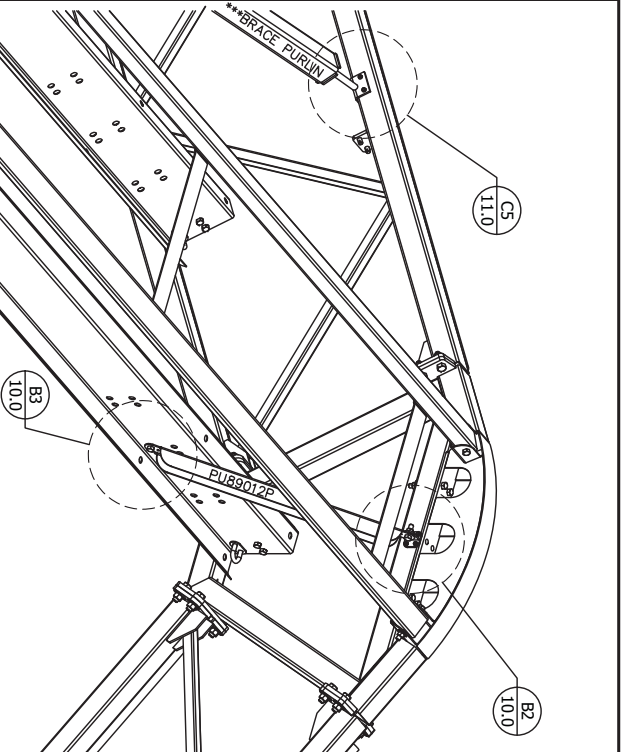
70'-80' VP END TRUSS CONNECTION AT PEAK - OUTSIDE
